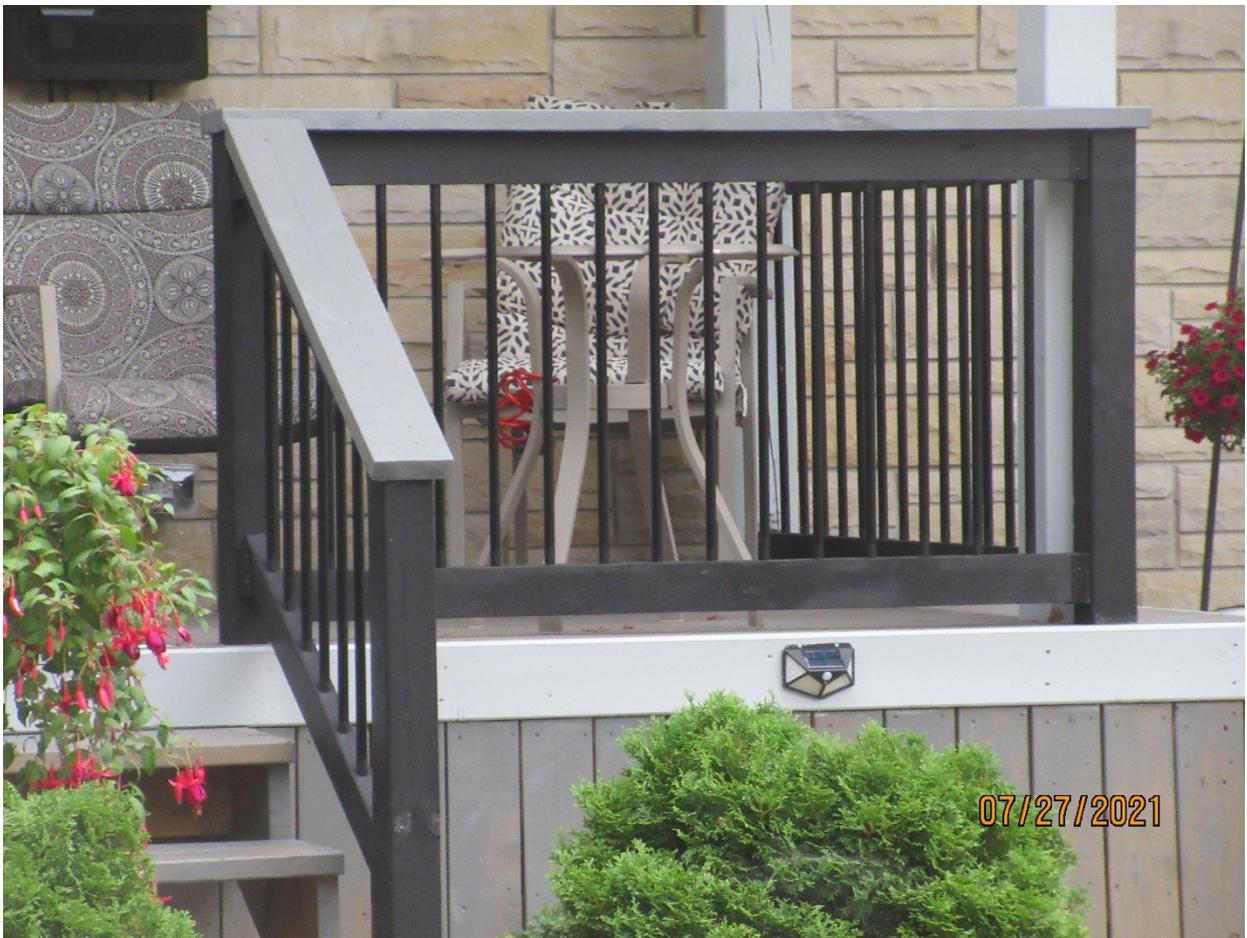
Detail of the railing system on the property at 59 Albion Street showing the unapproved NUVO Iron railing system, July 2021.
